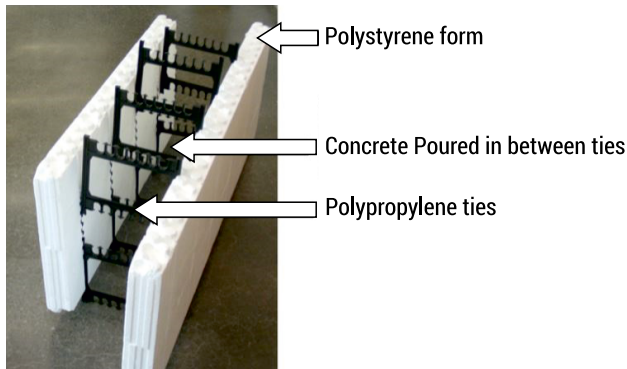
Insulating concrete form (Source: Rajagopalan et al., 2010)
